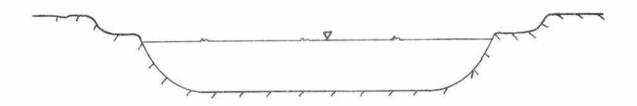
Shape of Typical Stable Canal with Natural Berms
